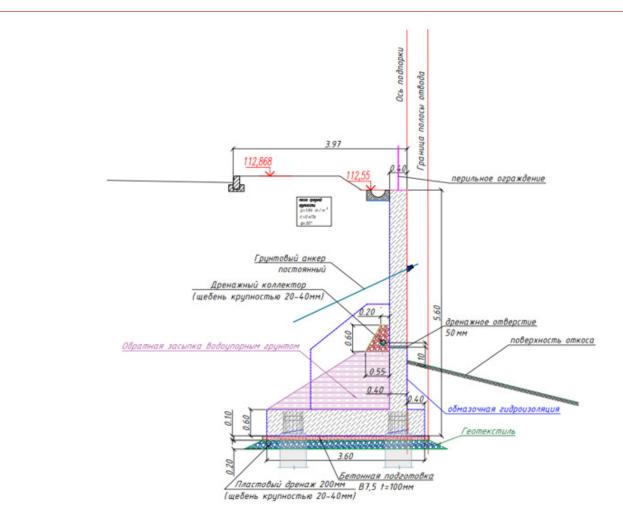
Attachment point for bored piles to a monolithic reinforced concrete corner retaining wall.
